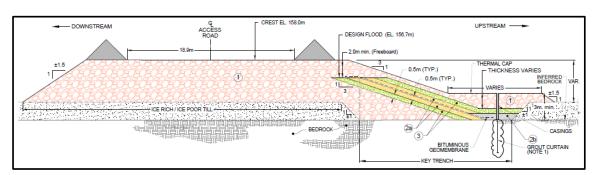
Typical Section of Whale Tail Waste Rock Storage Facility Dike
